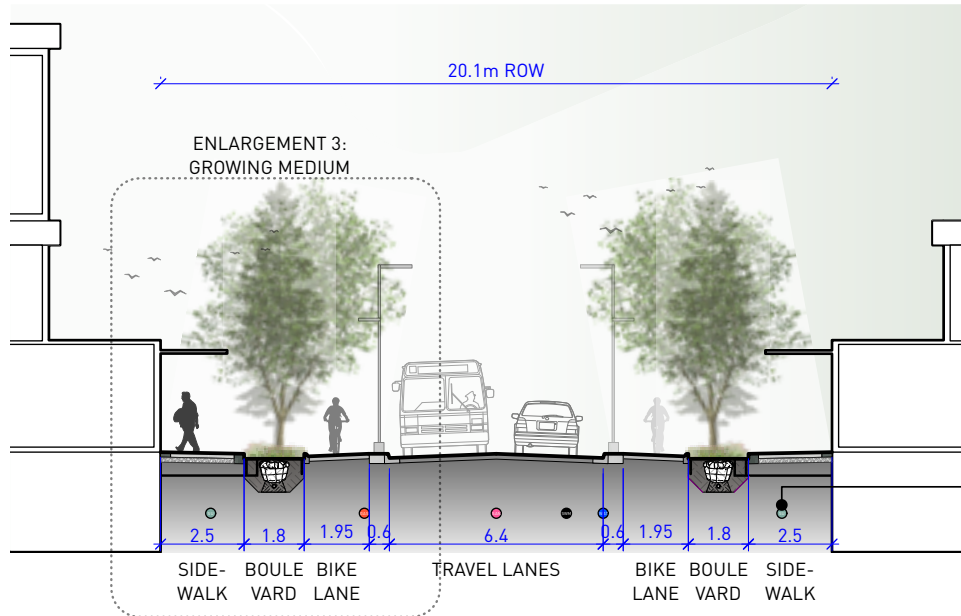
SECTION 1 - TYPICAL STREETSCAPE
